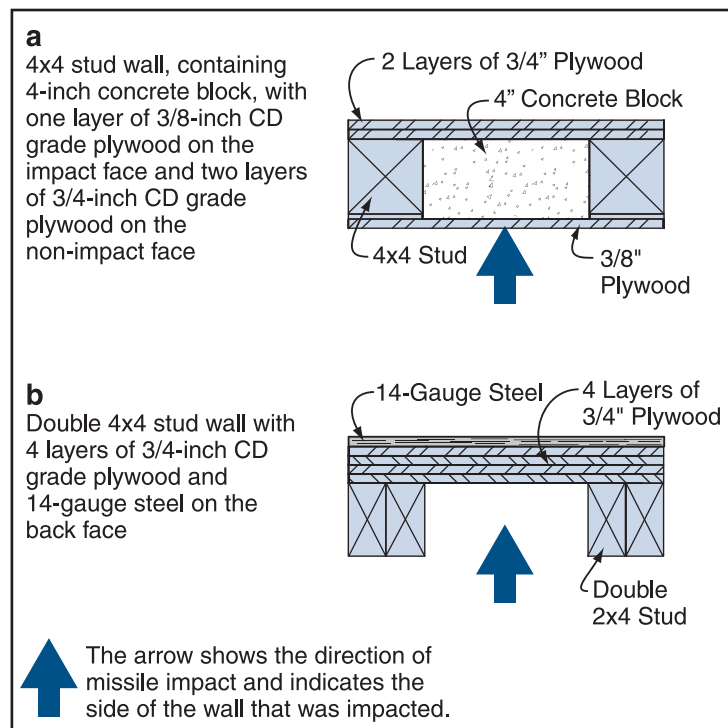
Wall sections constructed of plywood and masonry infill (a) and plywood and metal (b)
